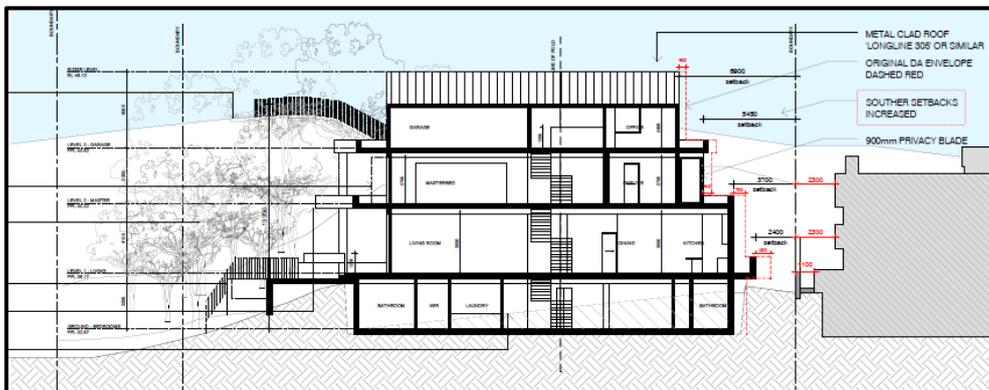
Excerpt of Section D noting the relationship between the proposed excavation works and the boundaries
